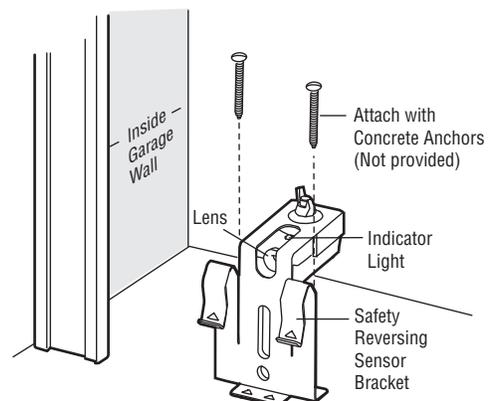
FLOOR MOUNT (RIGHT SIDE)
